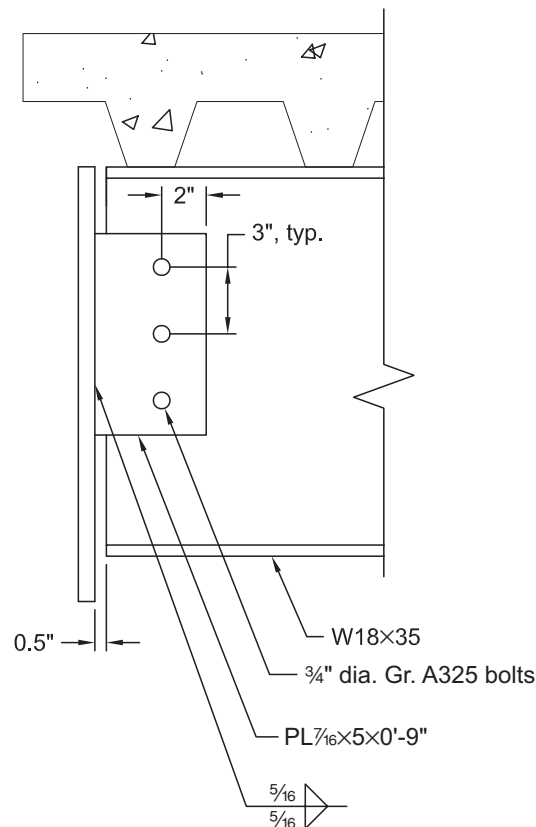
Shear tab connection used in CB-SP NIST composite beam test.
